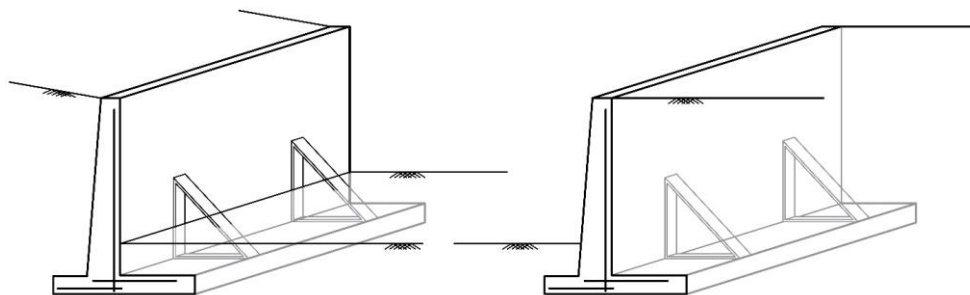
Buttressed cantilevered (left) and counterfort (right) walls.
